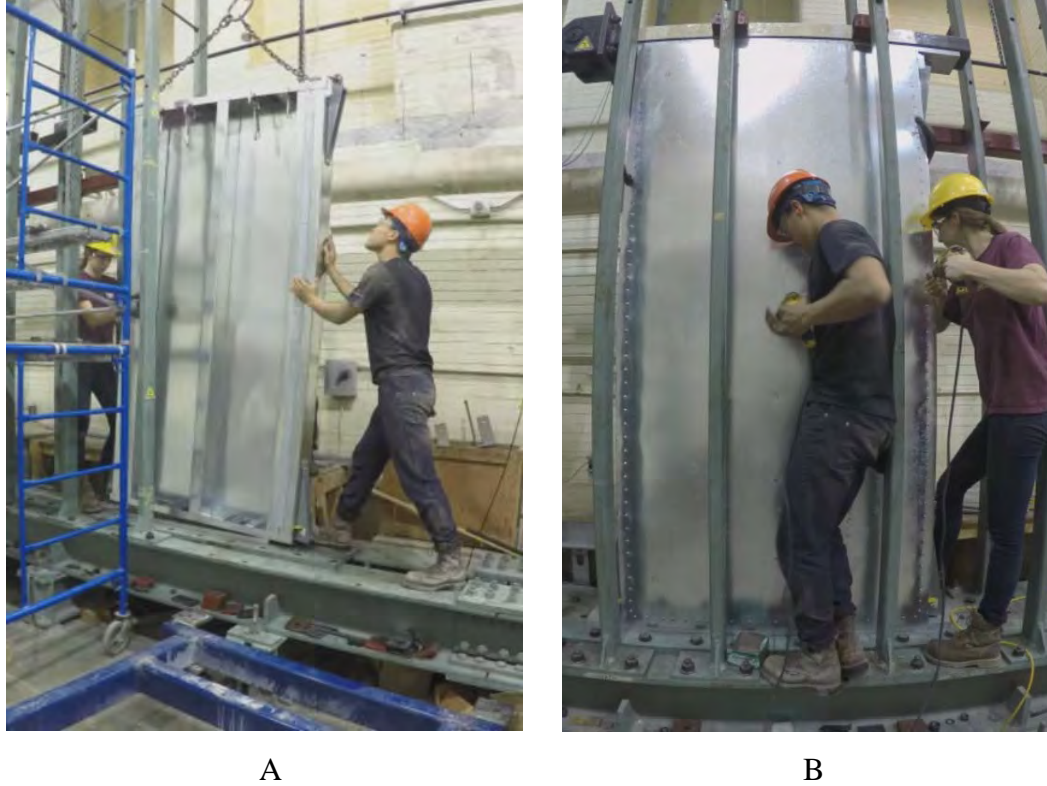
A) Installation of specimen into the testing frame. B) Installation of second sheathing panel.
